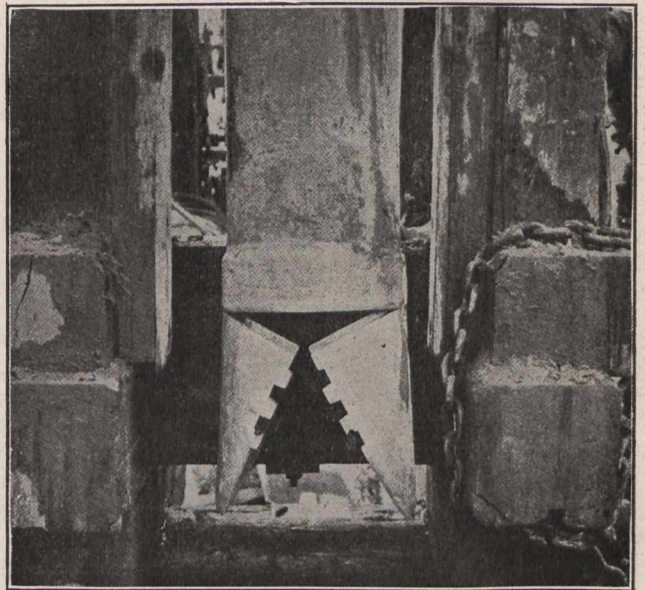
Concrete Pile, Made in Place, Showing Lines of Compression.
